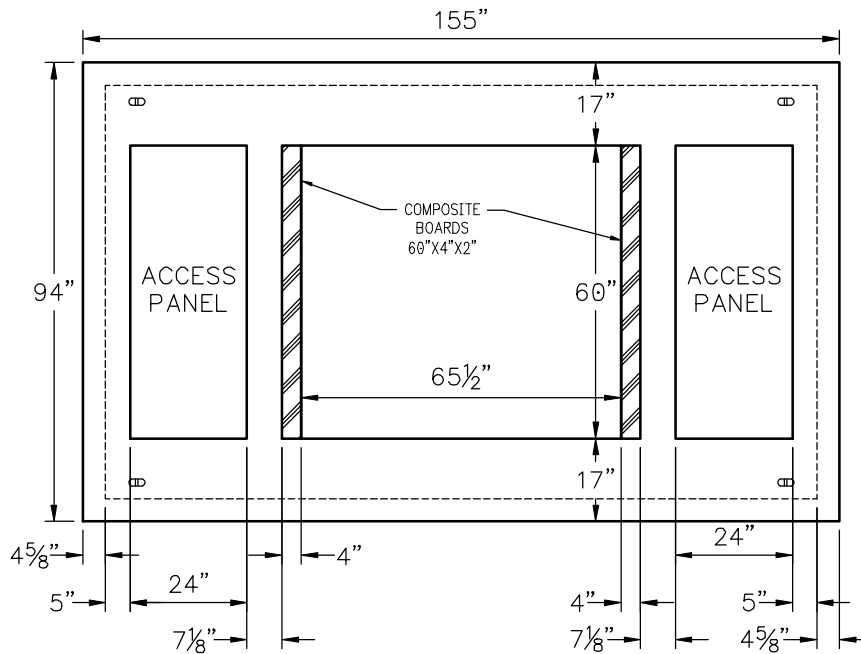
Padvault Pad Layout (SI# 7992788) for 15 kV, 600-Amp Type-9/11 Switchgear
